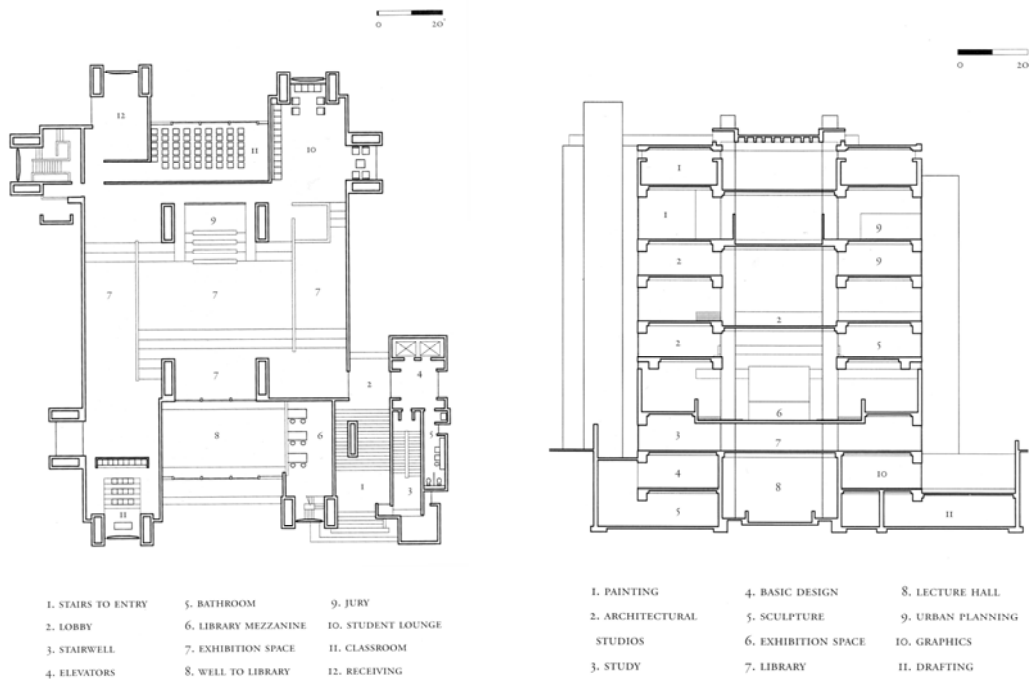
Yale Art and Architecture School. plan and section. (Stoller, p.23)
